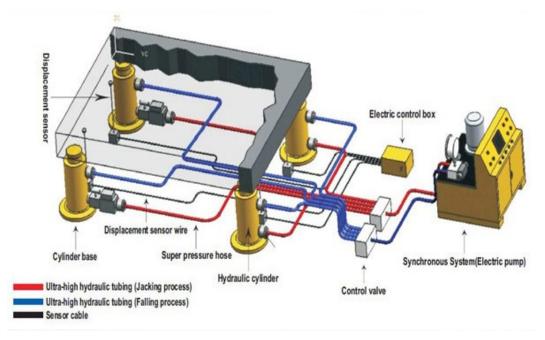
Unified Jacking system (Emmert Structural Elevation, 2018)
